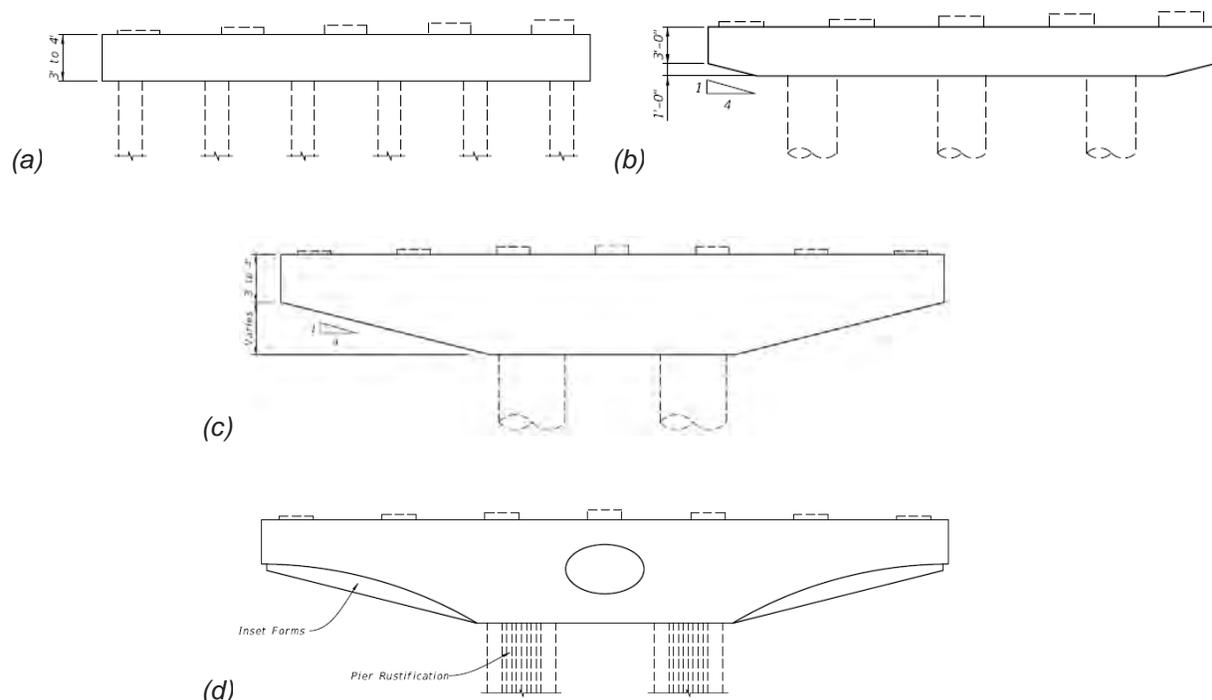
Precast Cap Options (a) Level 1 – Precast Pile Bent Caps; (b) Multi-Column Pier Caps; (c) Hammerhead Cap on Twin-Column Pier; (d) Potential aesthetic enhancements
